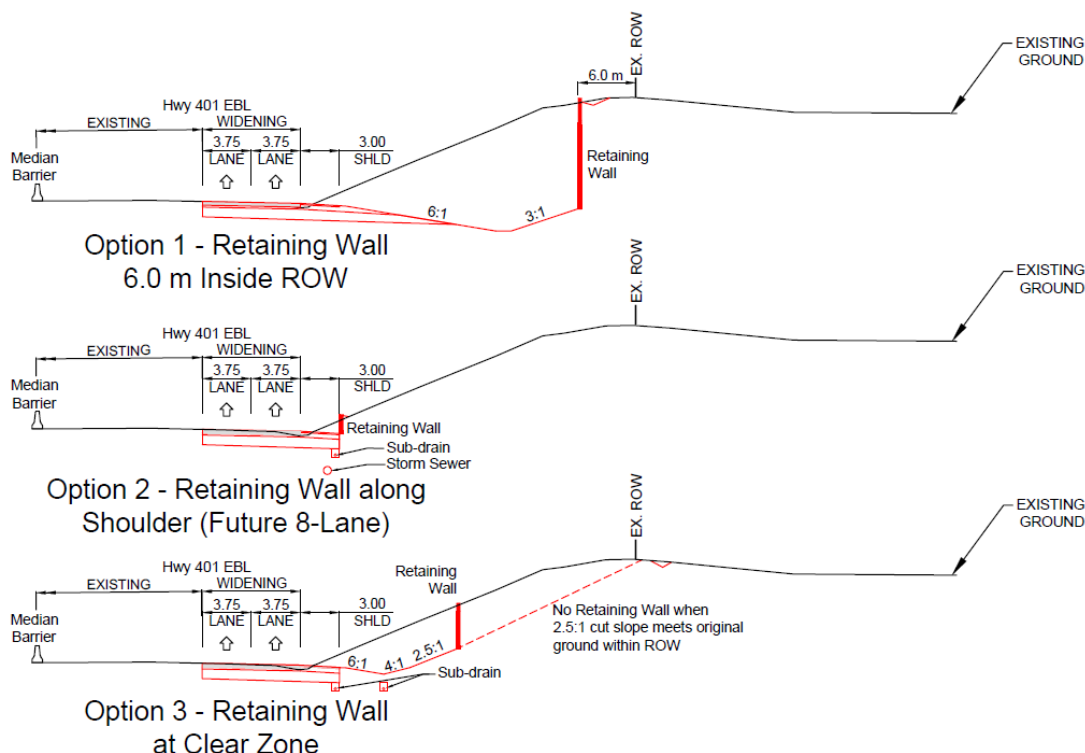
Preliminary Highway 401 Slope/Retaining Wall Cross Sections - 8-Lane Highway Configuration
